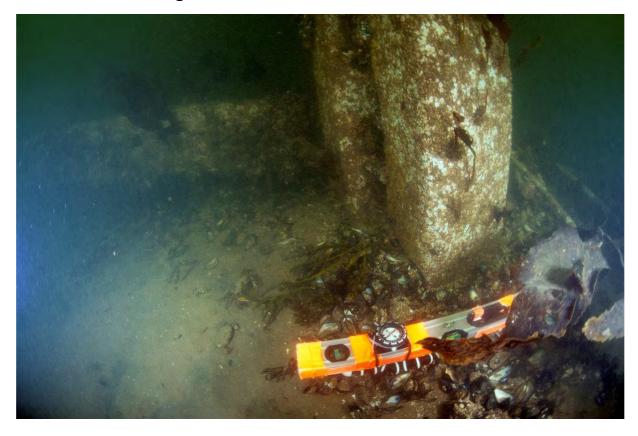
Helensburgh Pier – Pile 15 (scale = 58.5 x 6.0 cm)
